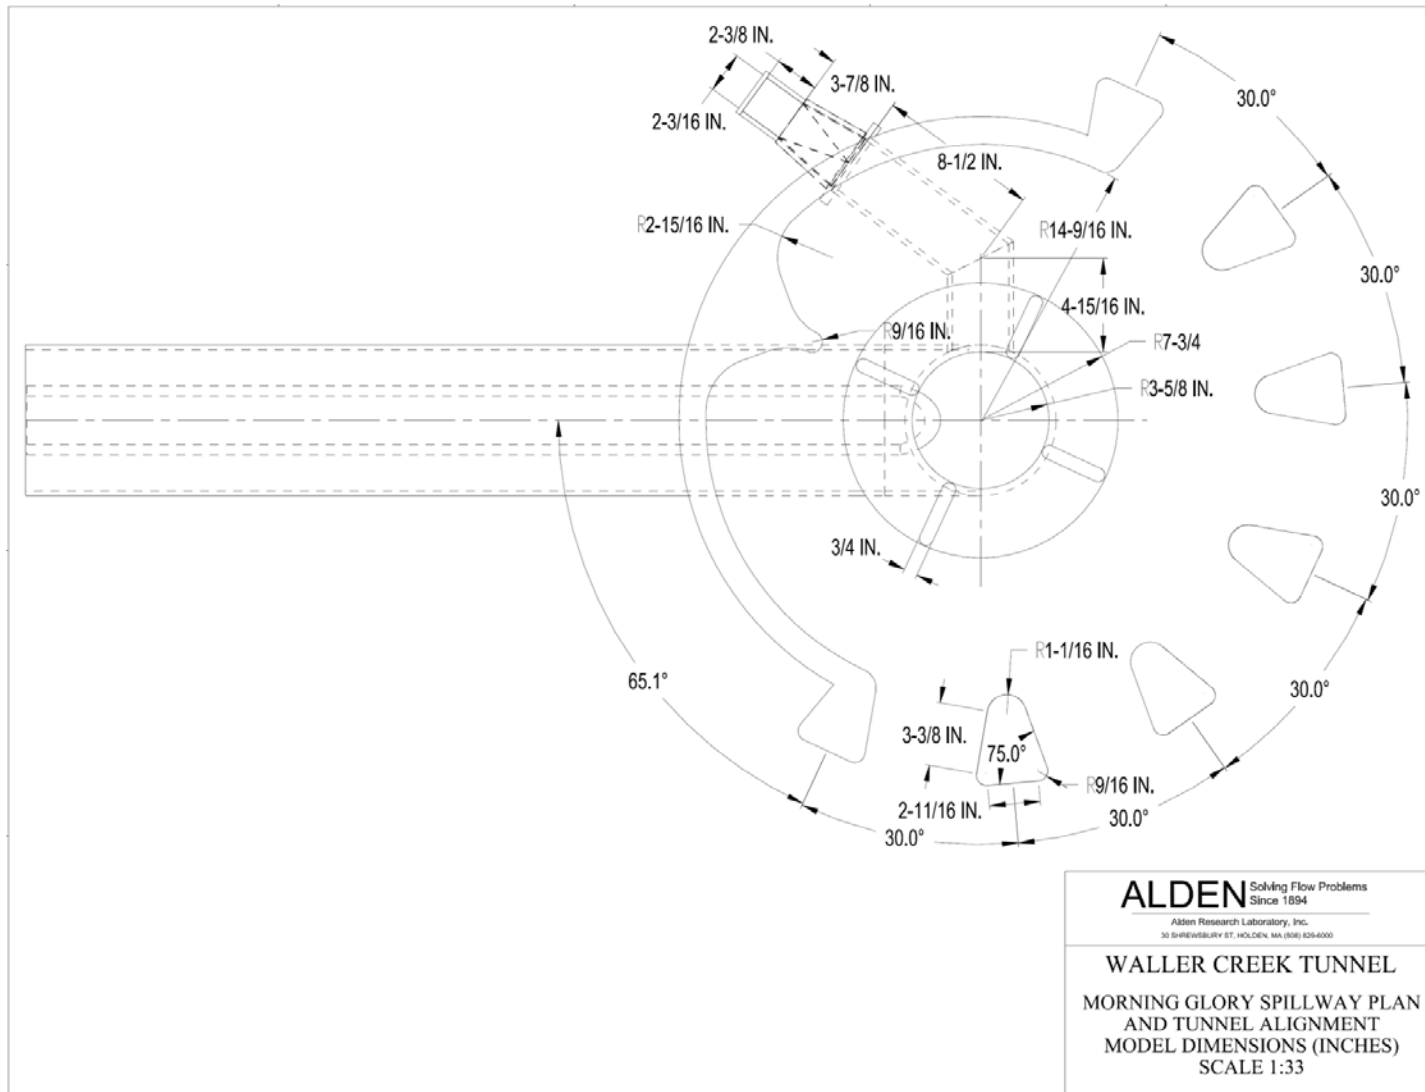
Waller Creek Tunnel Project; 1:33 Scale Model Morning Glory Spillway Dimensions –Plan
